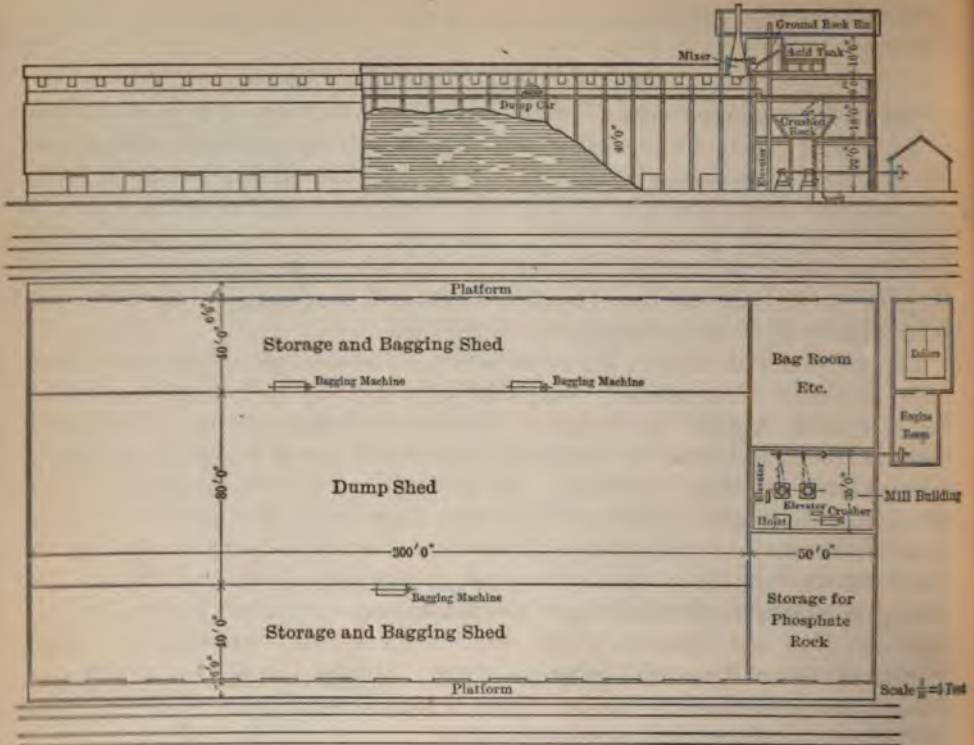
PLAN AND ELEVATION OF FERTILIZER WORKS, SHOWING TRACKS.
